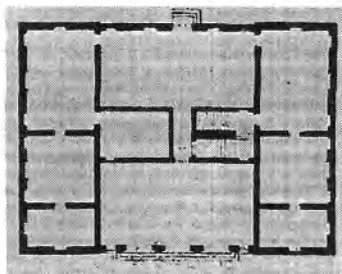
G. Trissino. Villa Trissino, Cricoli. Ground plan.
